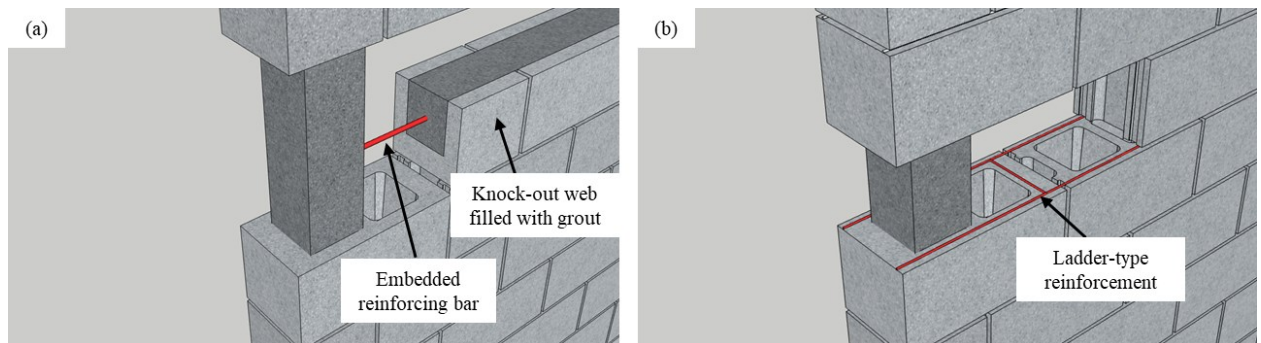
Types of horizontal reinforcement; (a) Bond beam reinforcement and (b) Bed-joint reinforcement
